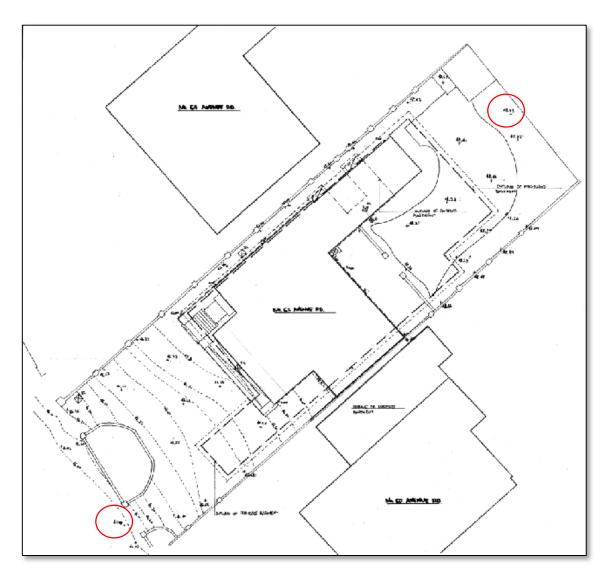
Extract of the Appendix 1, Plan 2 – Existing Site Plan and Topography
